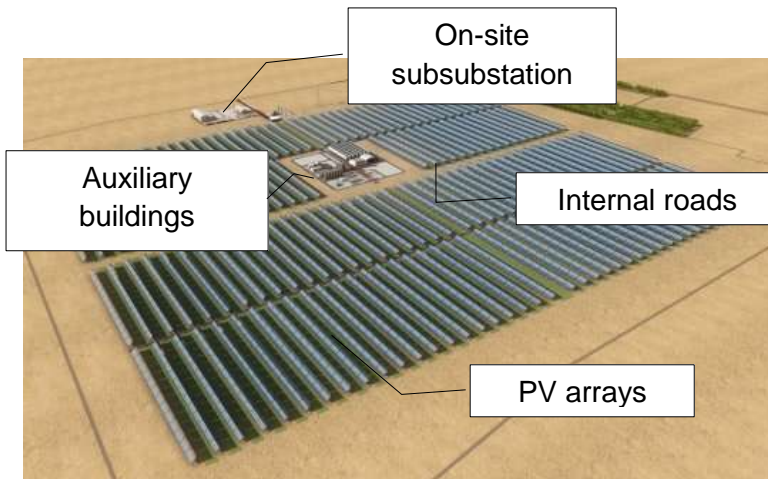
Typical Layout of a solar PV Plant (Solek, 2014)
